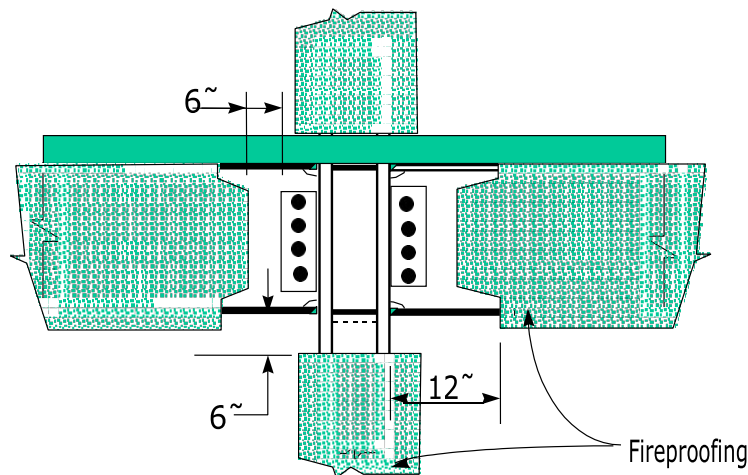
Fireproofing Removal for Complete Connection Inspection
